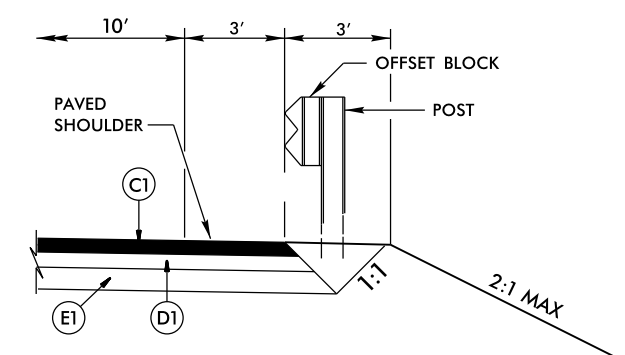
DETAIL OF GUARDRAIL WITH SHLD. BERM GUTTER
